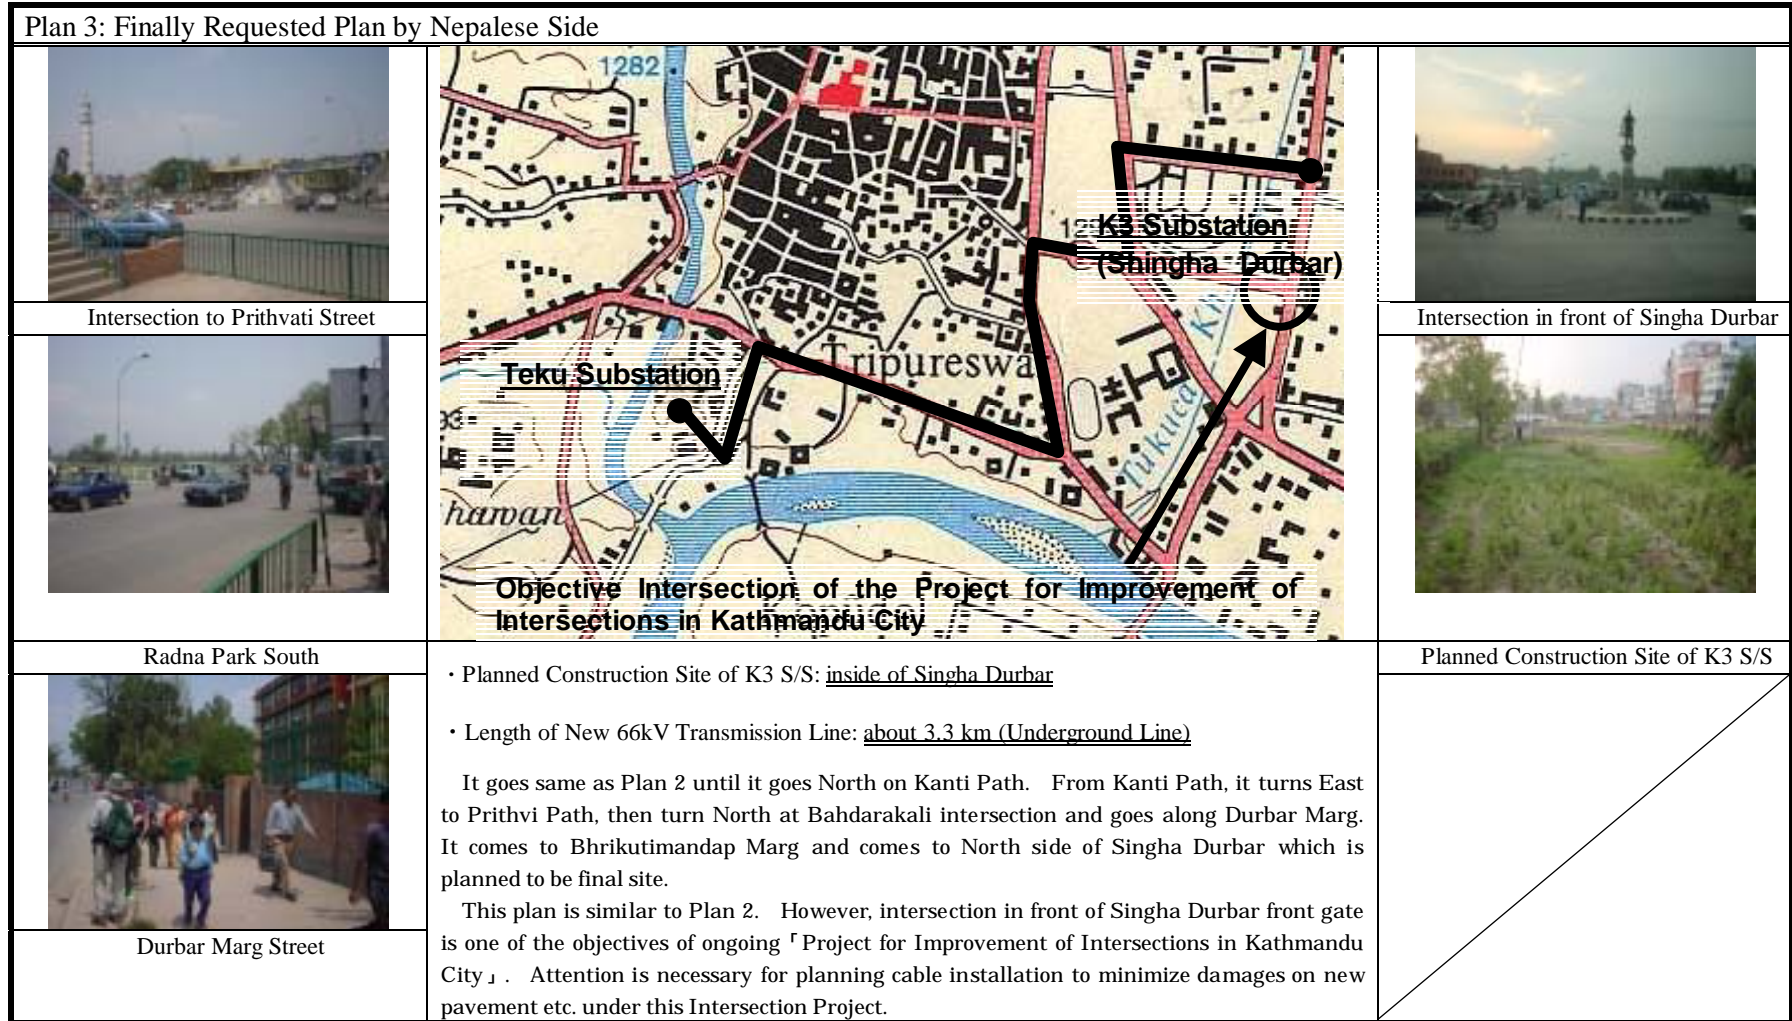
( 3/3 ) Plan 3: Final Requested Plan by Nepalese Side
